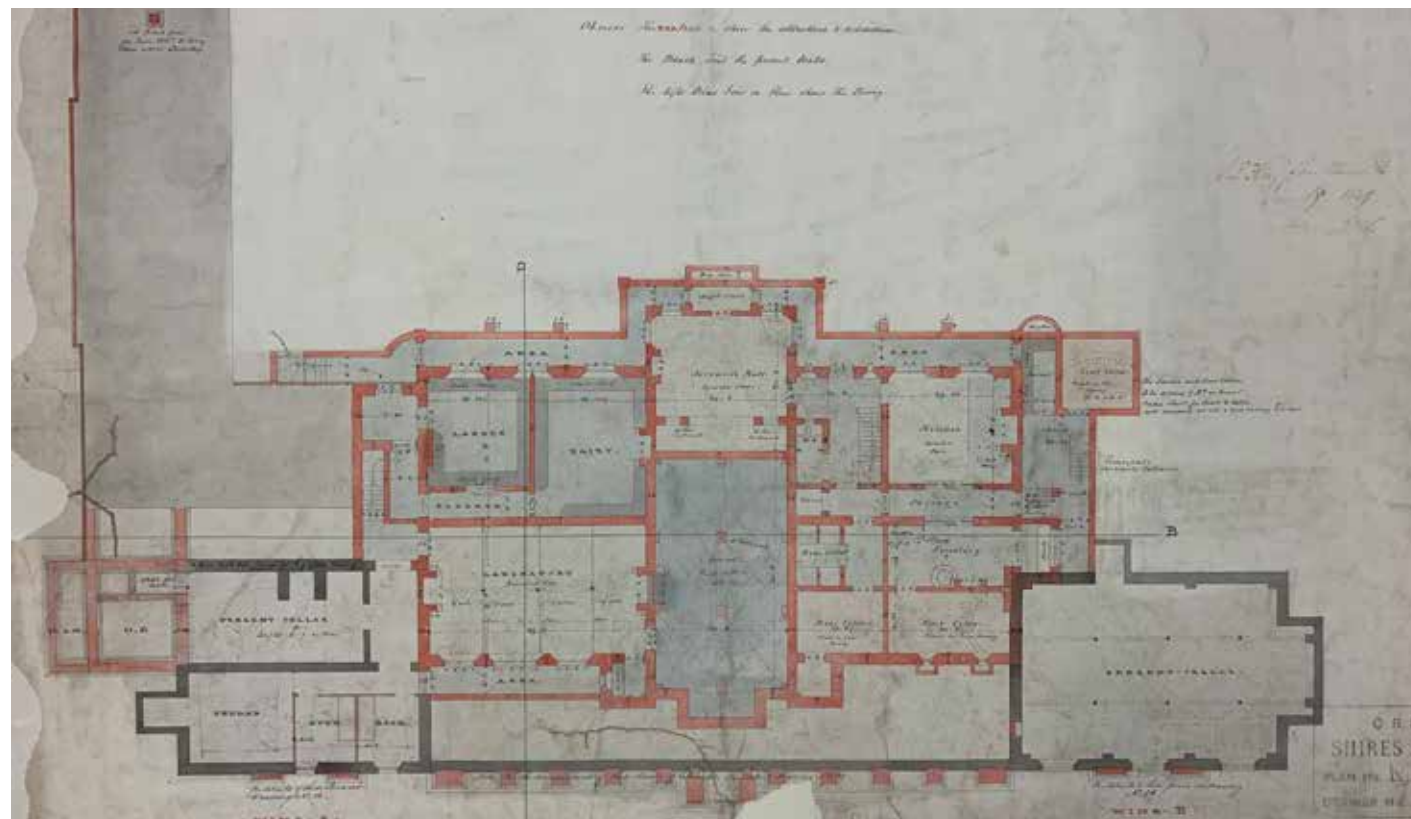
1844 proposed basement plan of Kneller Hall, partially realised (black showing the existing building and red showing the proposal). By George Mair.
